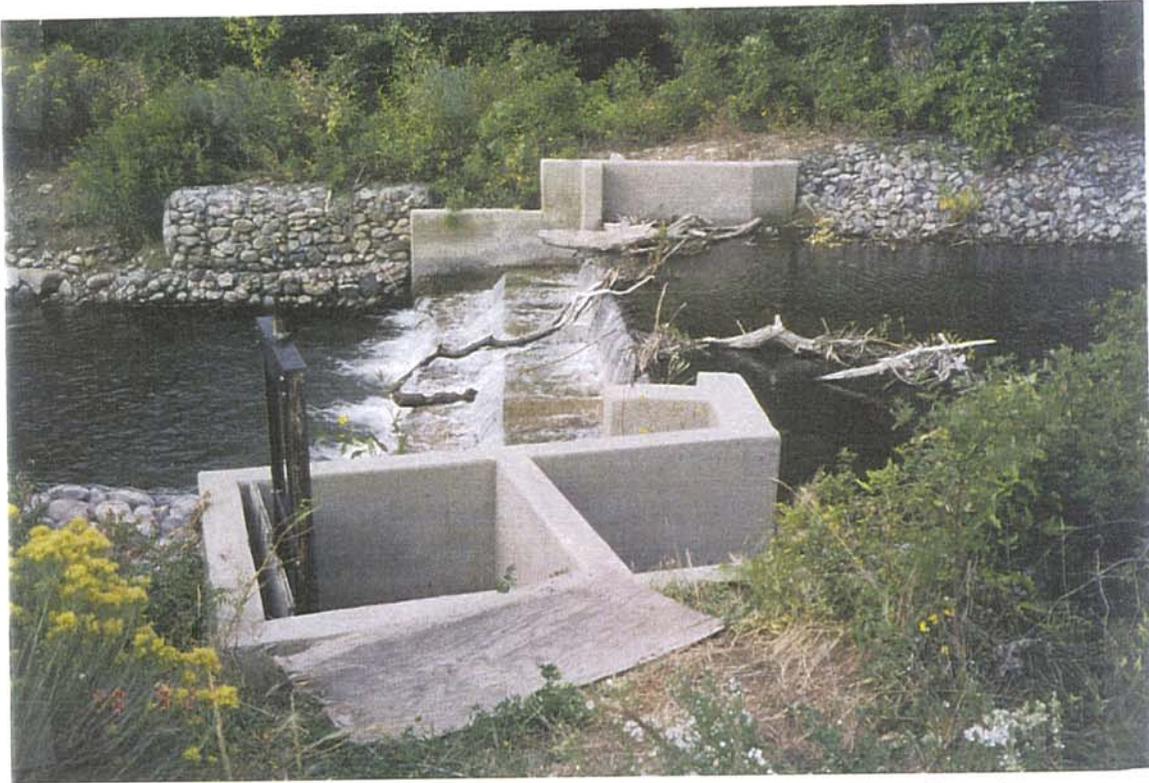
Pull Leaf Ditch (Taos Pueblo) - Looking across concrete diversion structure. Upstream bank was eroded, requiring riprap placement. Diversion headworks box has no cover, which is a safety hazard, and the slide gate is inoperable and needs replacement.
